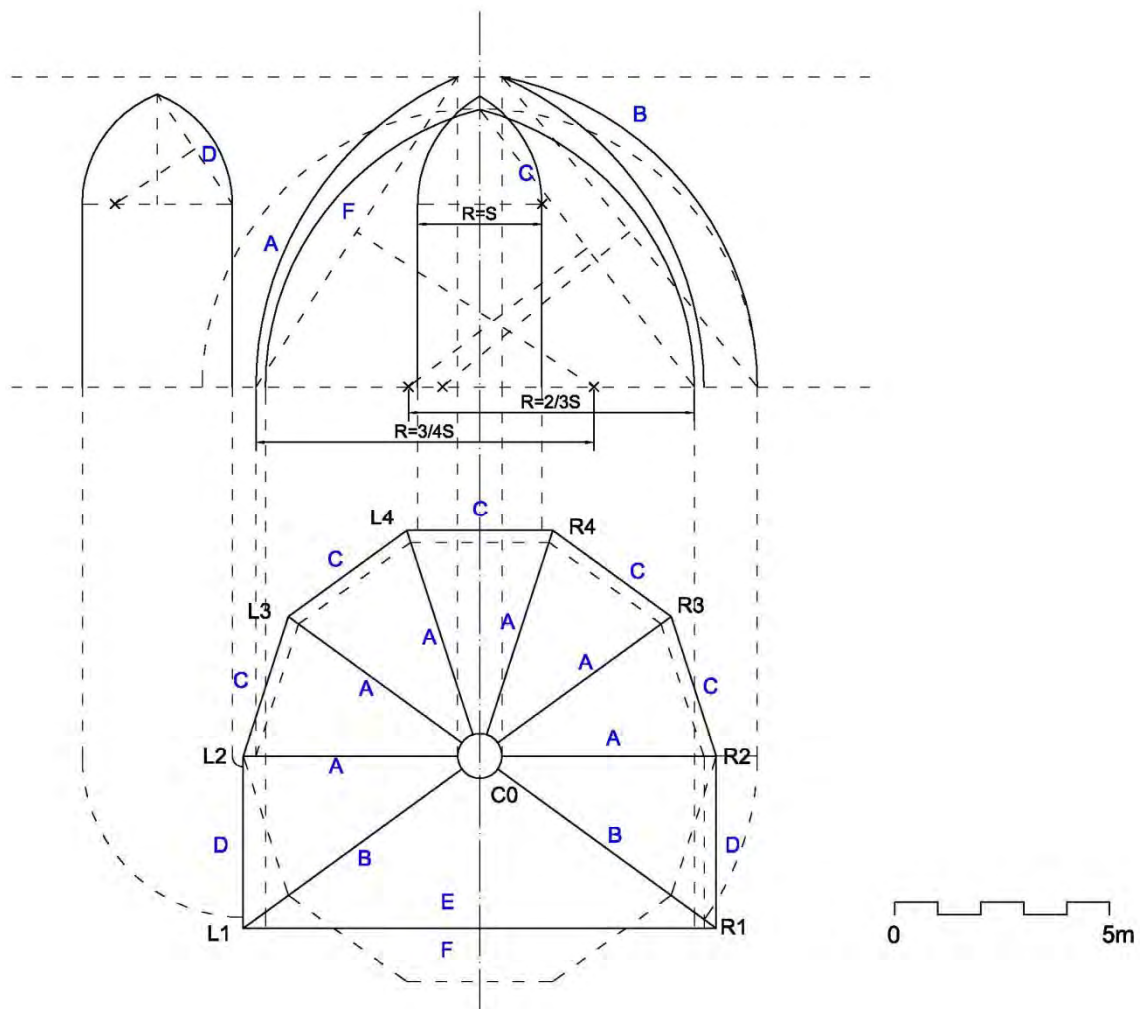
and 3b: Geometry and traces of the apse. Floor plan and Elevation
